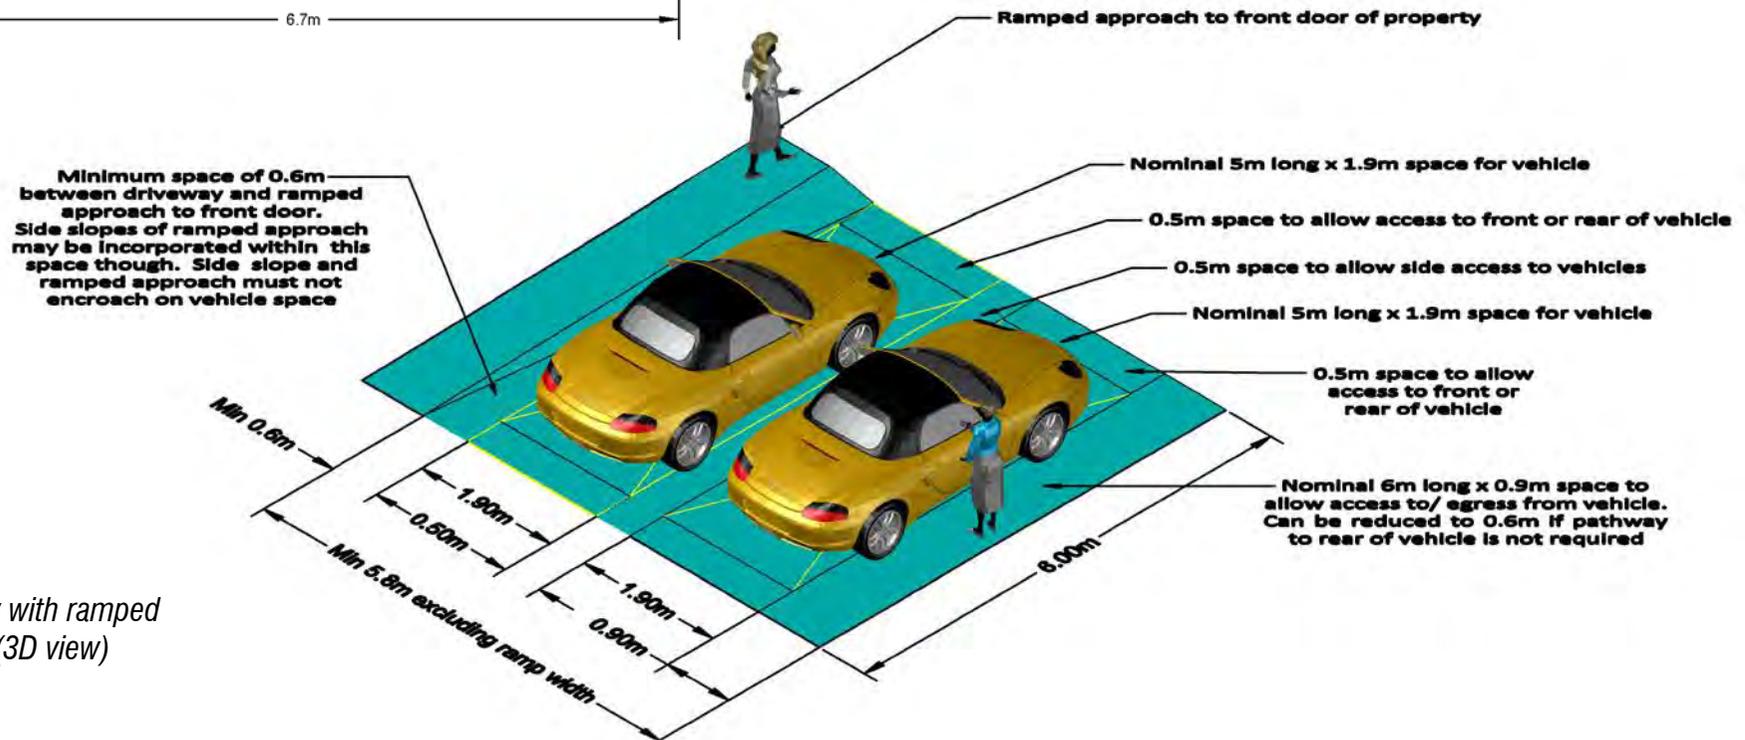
Layout of driveway with ramped access to property front door (3D view)
